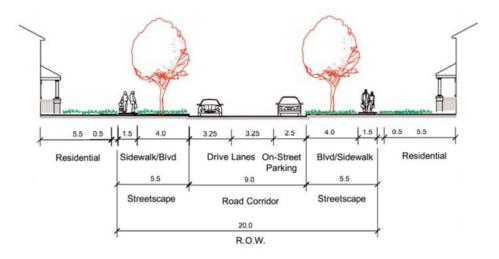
LOCAL ROAD, KSP PROPOSED CROSS-SECTION
